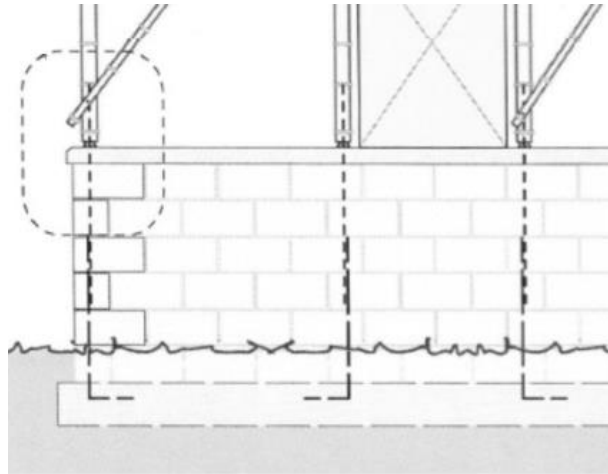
Diagram showing CMU plinth wall with Shear Cap and Strip Footing
